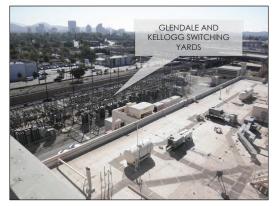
Overview of Project Area from Roof of Grayson Boiler Building Looking Southeast at switching yards
